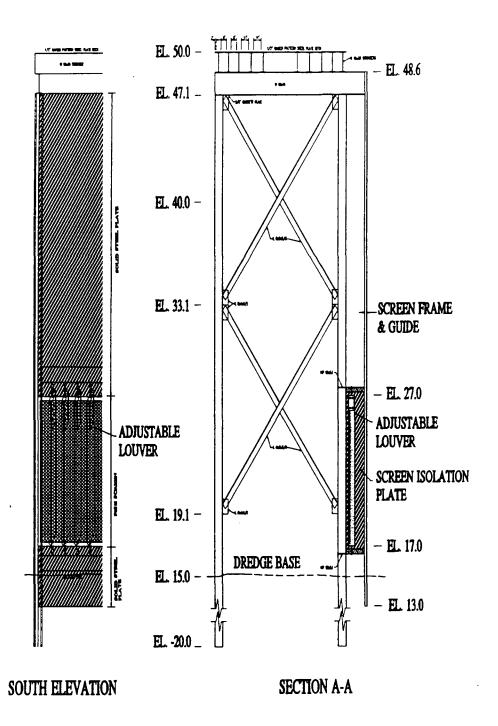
Laugenour and Meikle's design drawings of the south elevation and section A-A (from figure 1) for the Wilkins Slough positive barrier fish screen.
